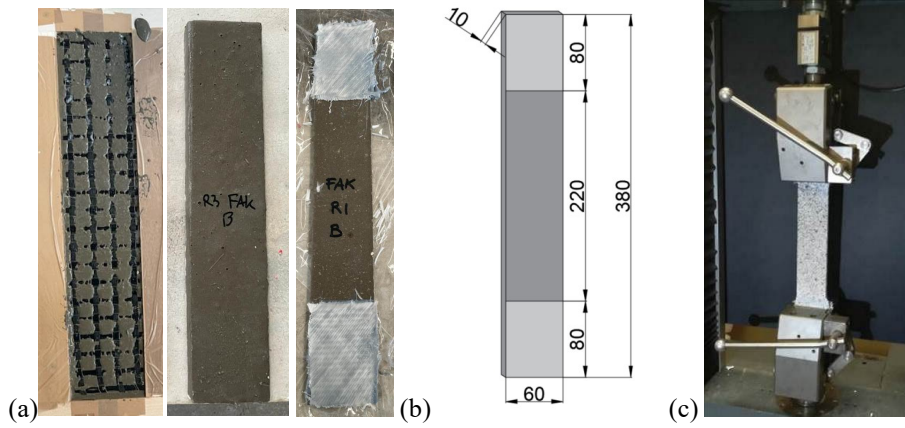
Tensile test: (a) Specimens manufacturing, (b) TRM coupon geometry and (c) test setup.
